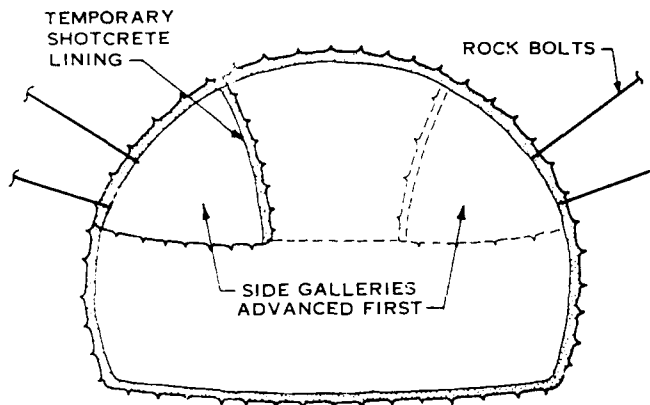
DOUBLE TRACK TUNNEL IN MIXED FACE CONDITION.
